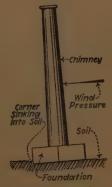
Leeward corner of foundation sinking under wind pressure.
